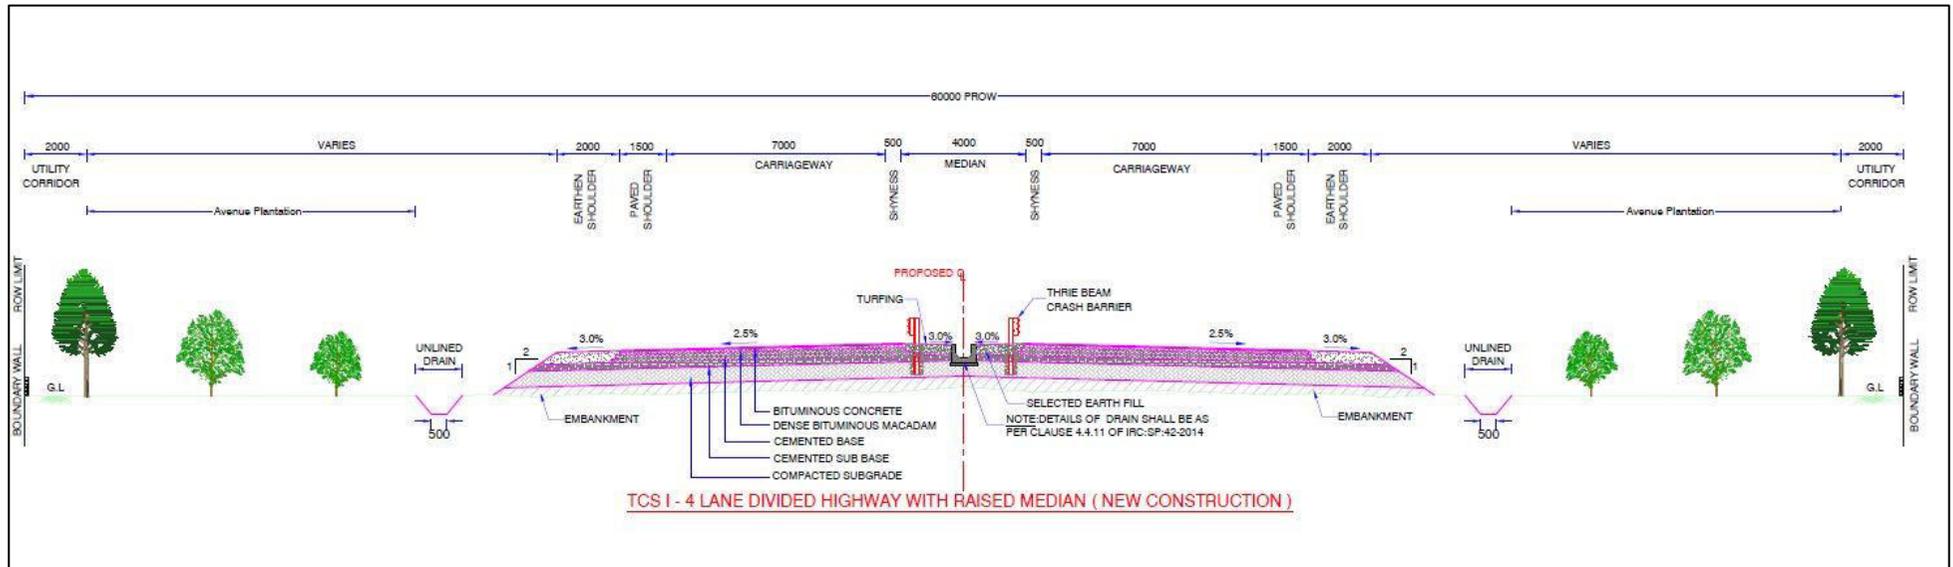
Typical Cross Section for Lane Divided Highway (New Construction)
